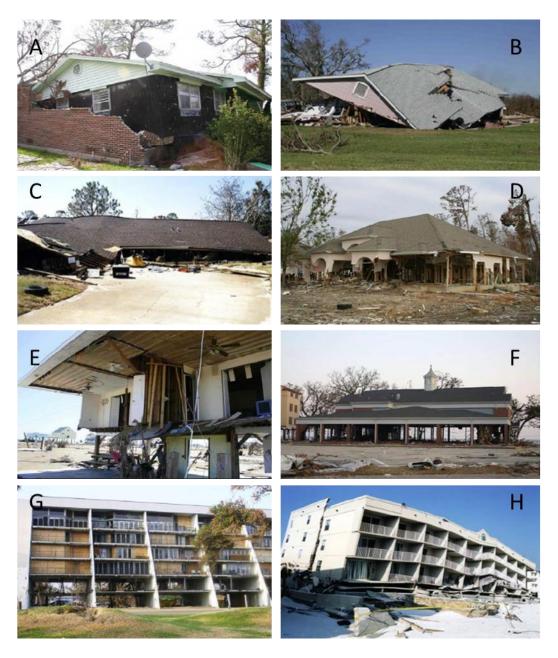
Examples of previous US storm surge damage to buildings [source: Marshall (2014)]
